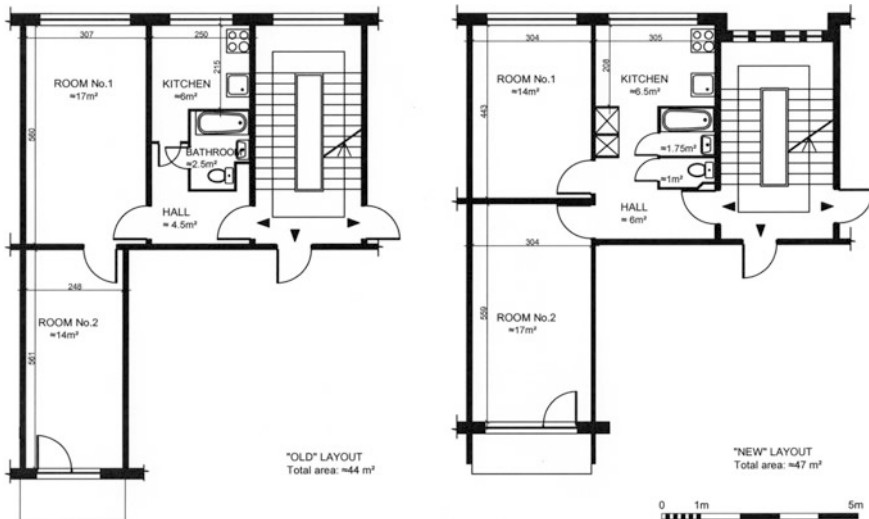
Plans of ‘old’ and ‘new’ one-bedroom apartments. *Source* Drawing by V. Janušauskaitė (2018), based on original plans
